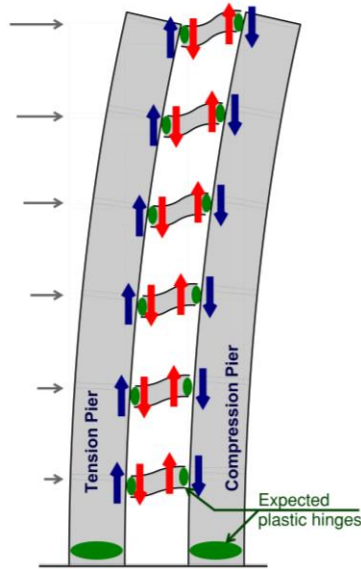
Coupled wall deformed shaped; applied axial force from coupling beams on wall piers and expected plastic hinges.
